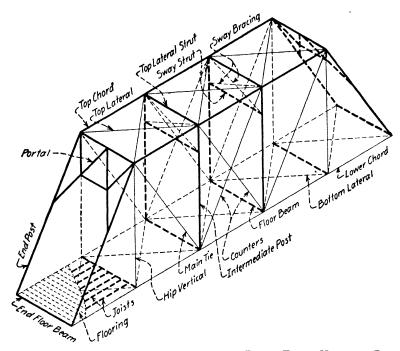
DIAGRAMMATIC SKETCH OF A THROUGH PRATT TRUSS HIGHWAY BRIDGE.
